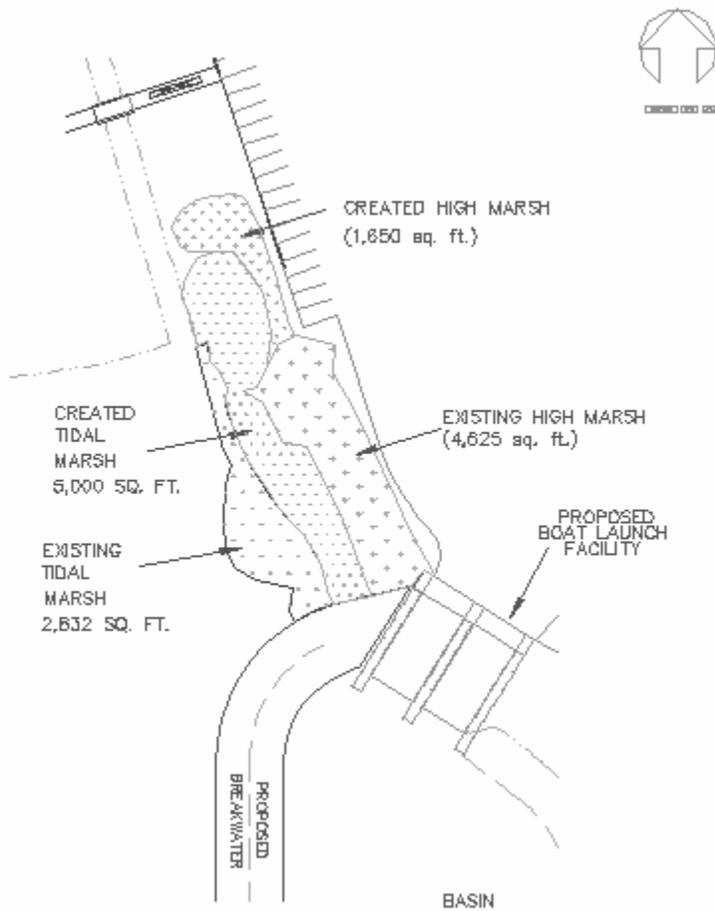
Facility Improvement Mitigation Marsh Plan Detail. Design by Brown and Mitchell, Gulfport, MS
